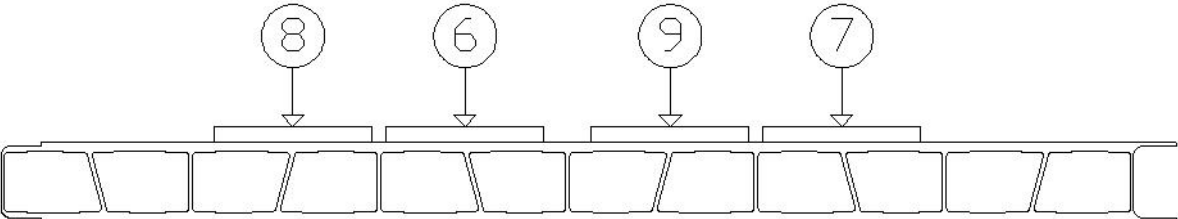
Representative Layout of For the Placement of the Steel Test Pads Prior to Testing
